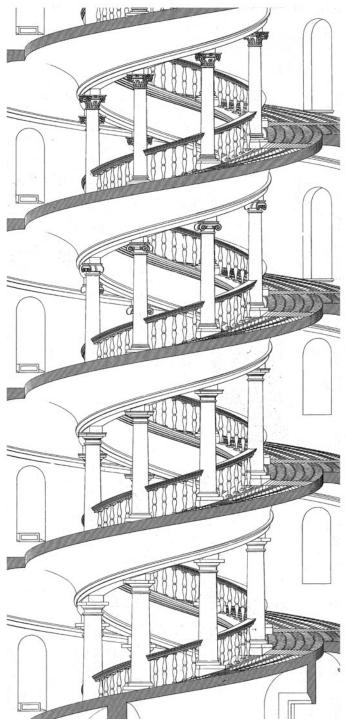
Rome, Belvedere staircase: cross-section (after Letarouilly)
